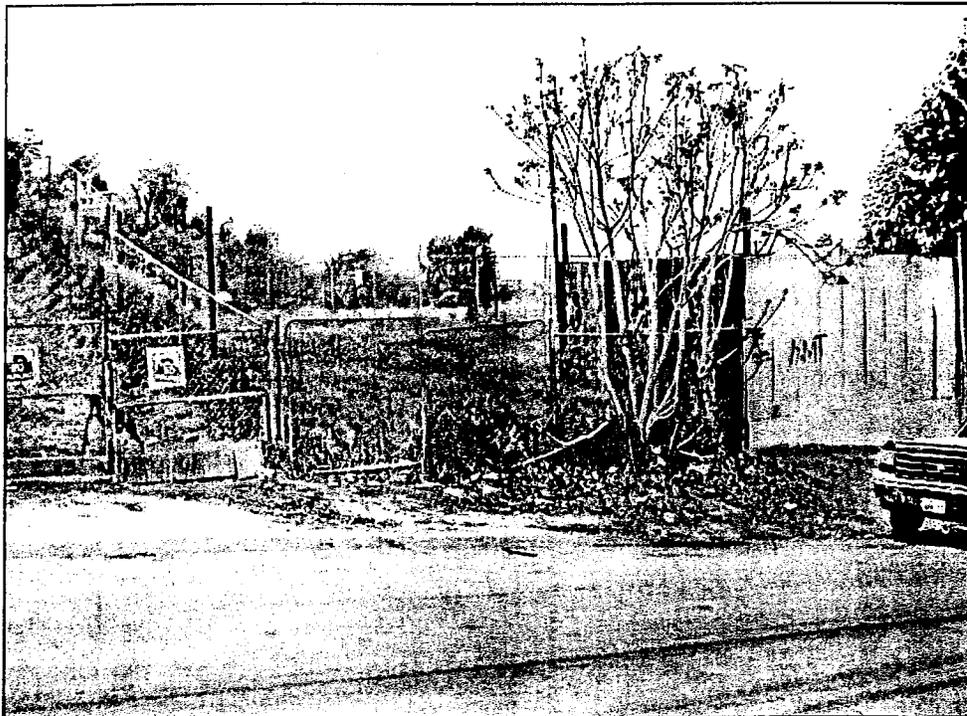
No sidewalks, curbs or gutters in alley west of Bonnie Beach, between Medford St. & Whiteside St.
